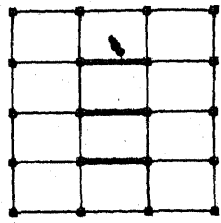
TYPICAL PLAN OF CORE-WALL TYPE BUILDING.
